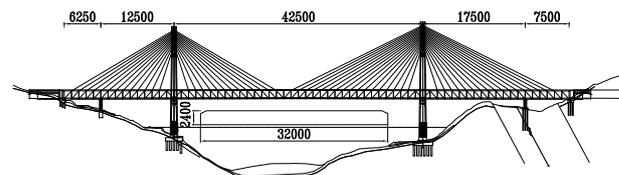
General Layout of Mingyuexia Yangtze River Bridge
